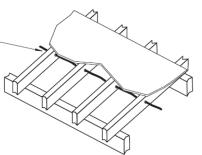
PROTECTION OF WIRING SYSTEM BELOW ROOFING MATERIAL
